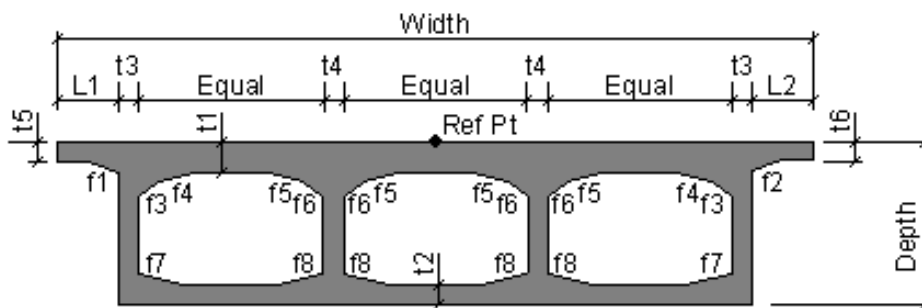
Vertical R. C. box girder bridge section (extracted from sap2000)
